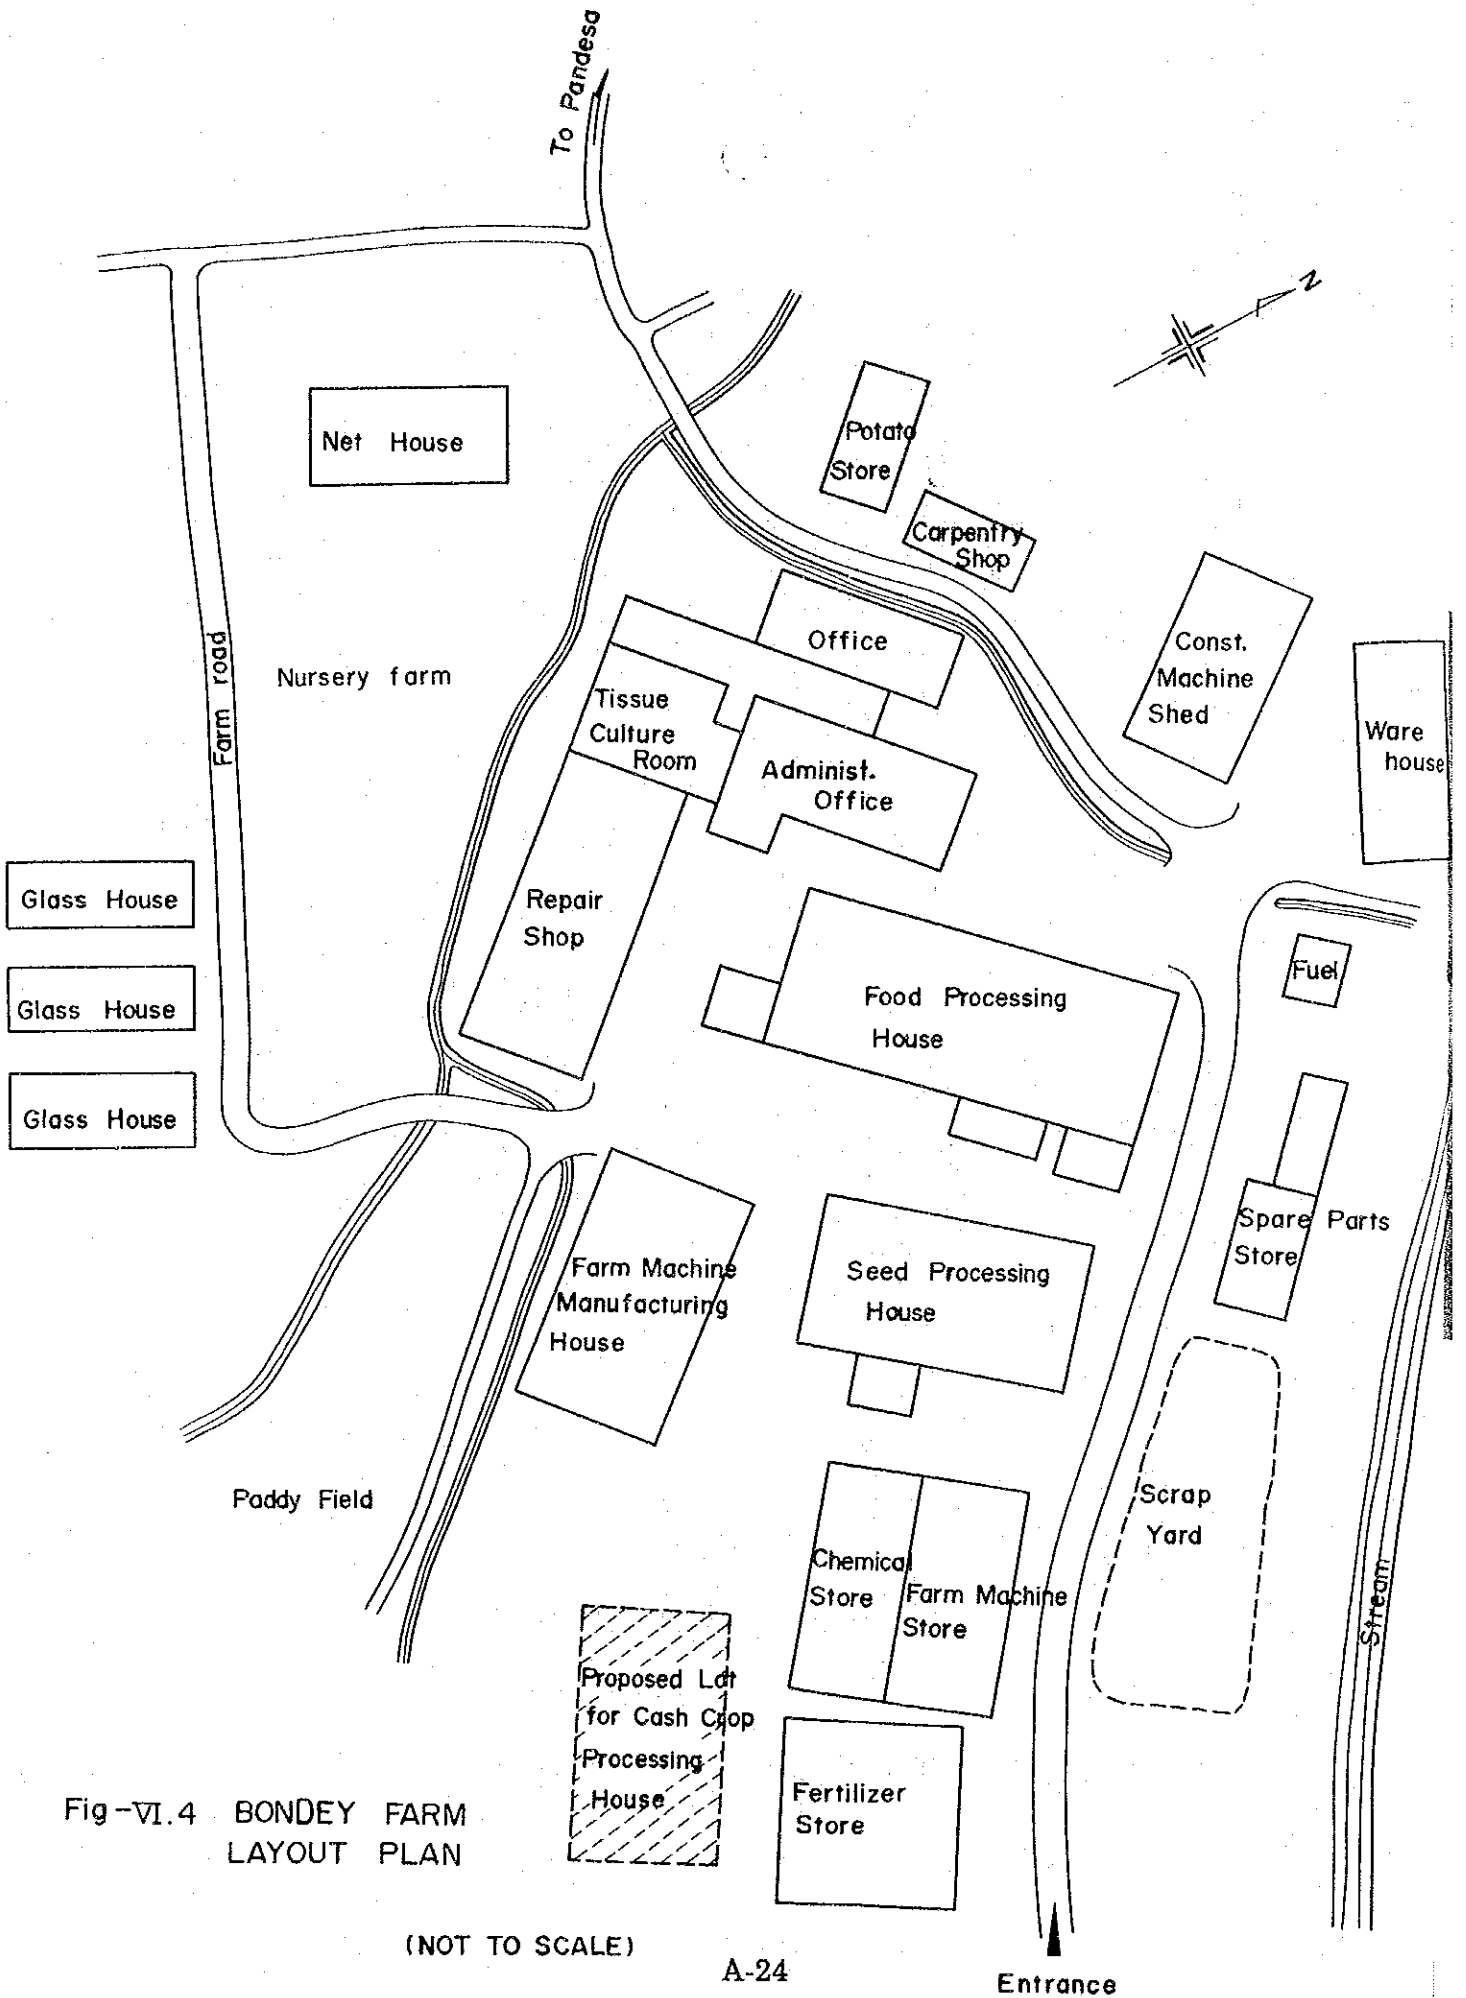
BONDEY FARM LAYOUT PLAN
